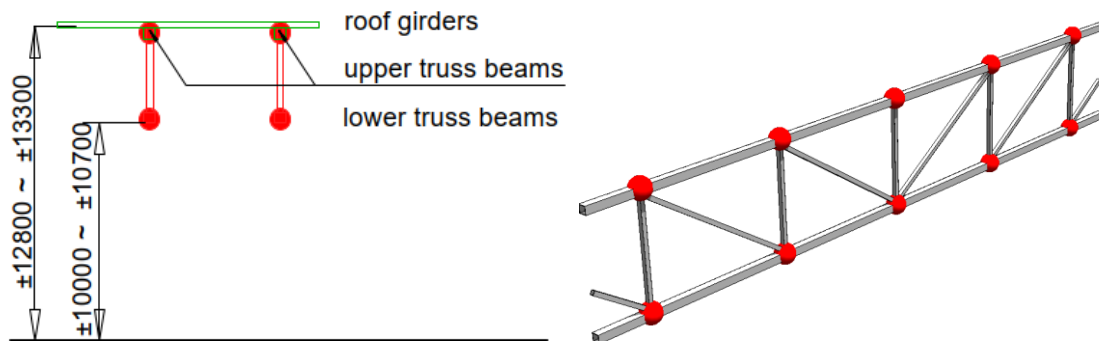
North Hall suspension points (●) lower and upper beam in cross-section and isometry
